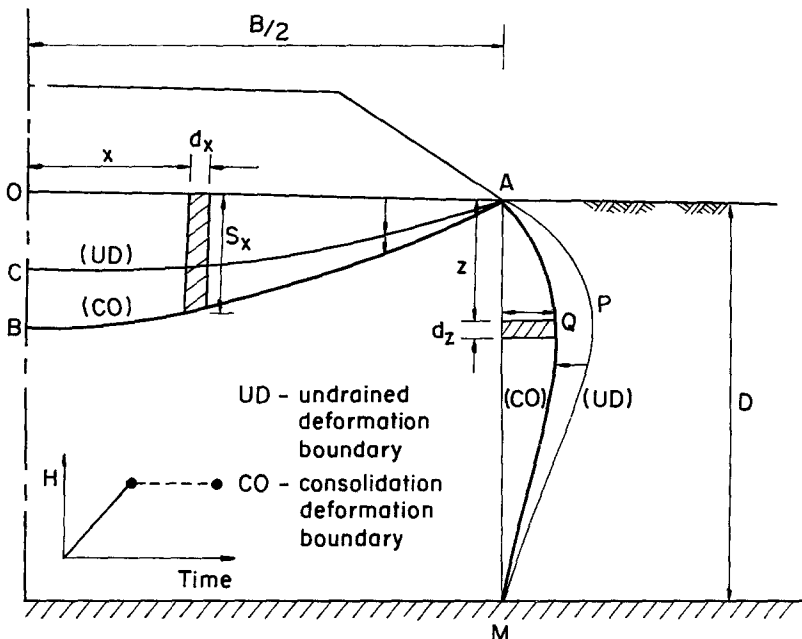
Deformation Pattern of Embankment Foundation at End of Loading Stage
